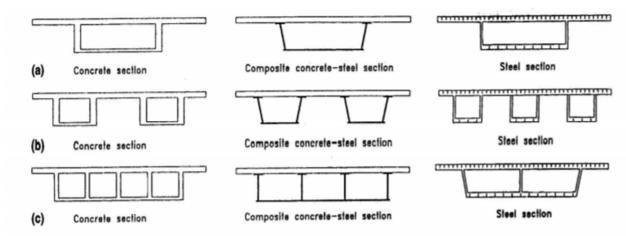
Different types of cross sections for a box girder bridge [19]
